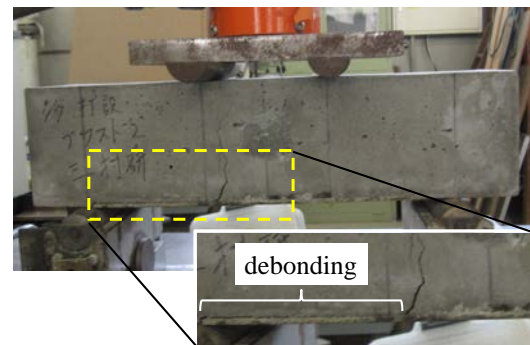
Concrete cracking and debonding of steel plate
